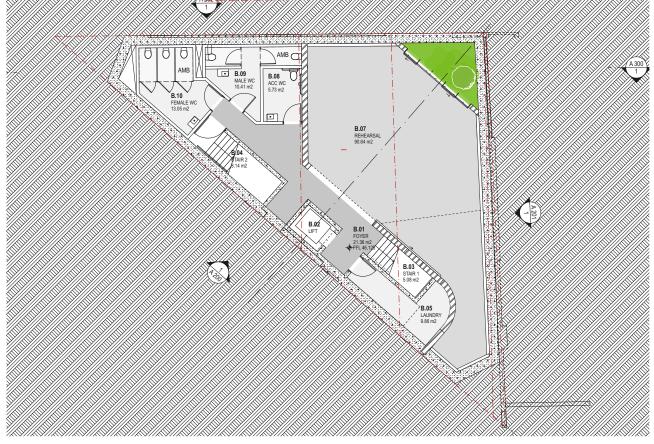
Basement Plan. Source: TZG Architects, 2022.
